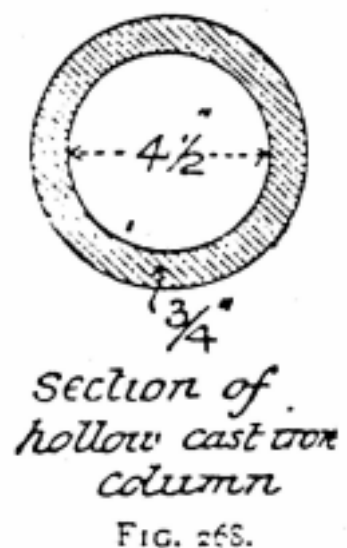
Text book section of hollow cast iron column. Source: Burrell.
